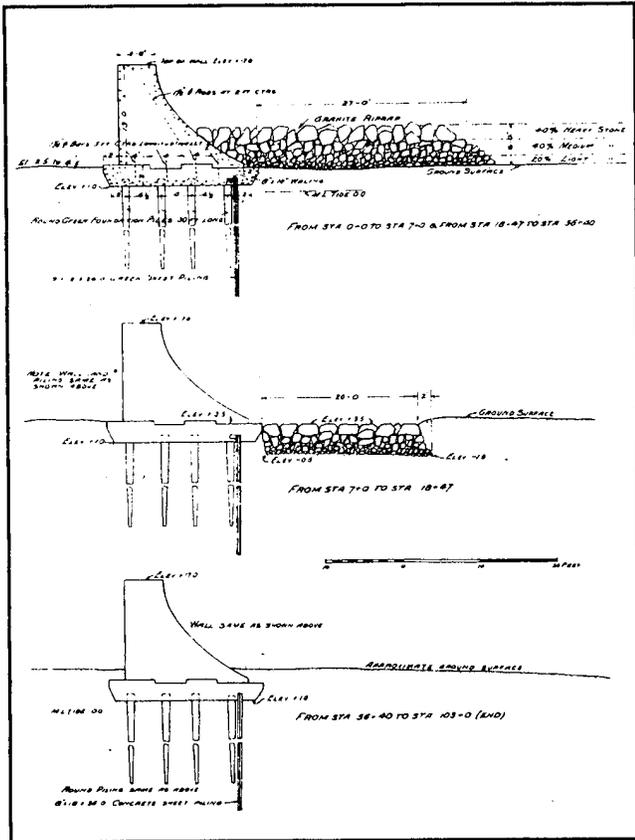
Typical Cross-Sections of Seawall as Constructed.¹⁵
